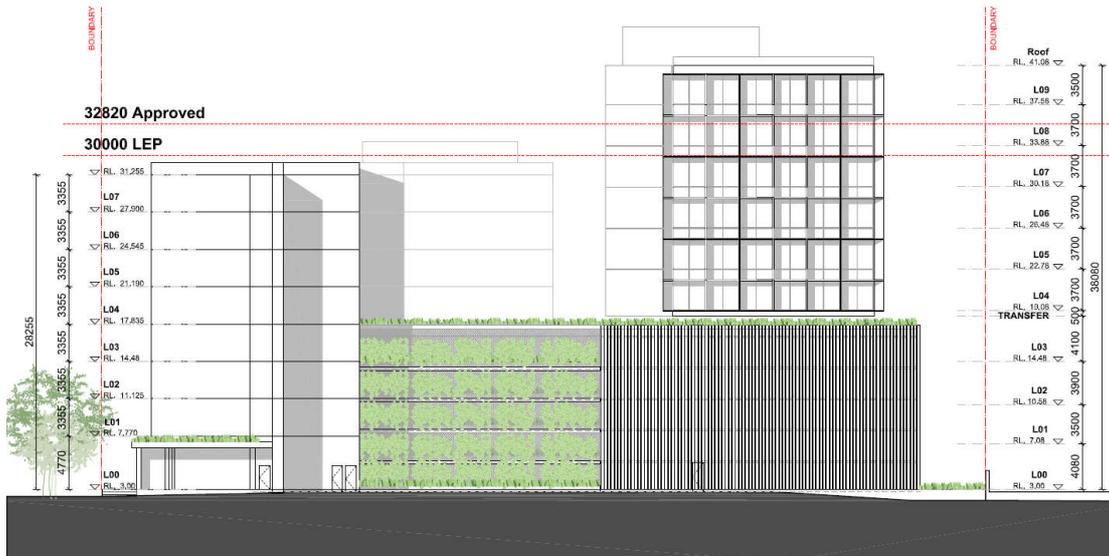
The South West Elevation showing the Commercial building right and the Hotel left. (Bates Smart)
